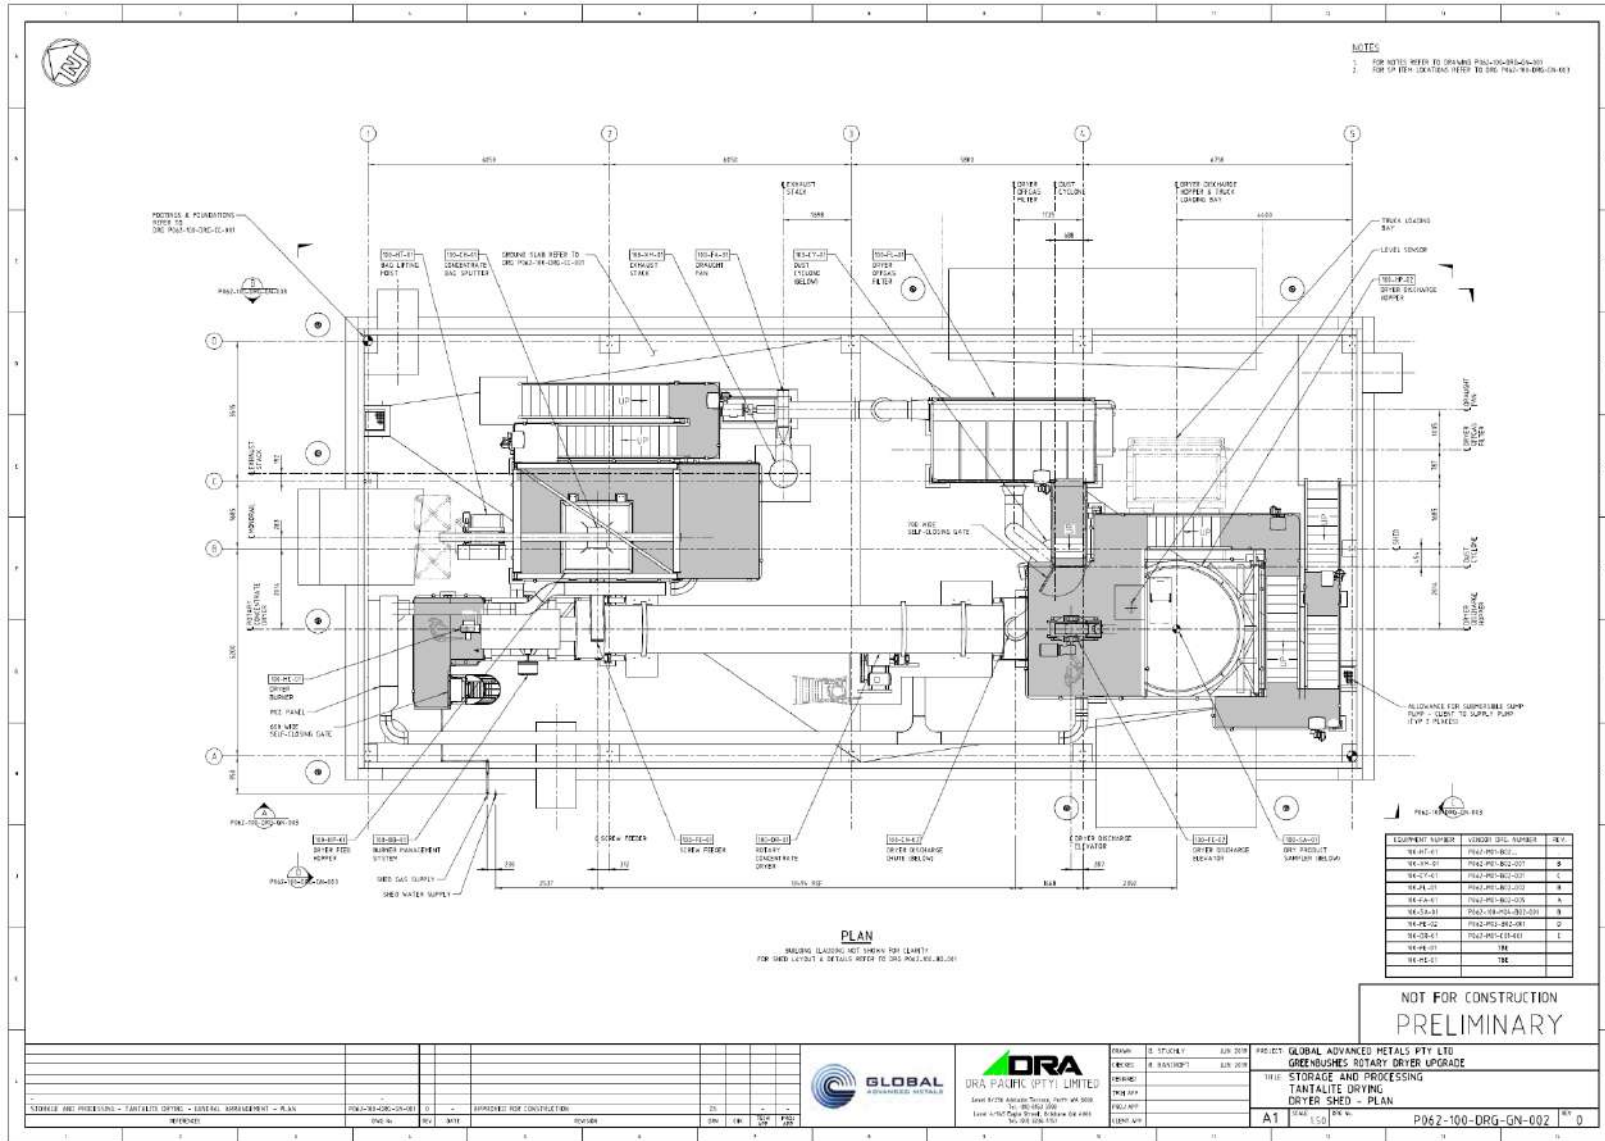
Tantalite dryer shed plan (zoomed in from Figure 3)
